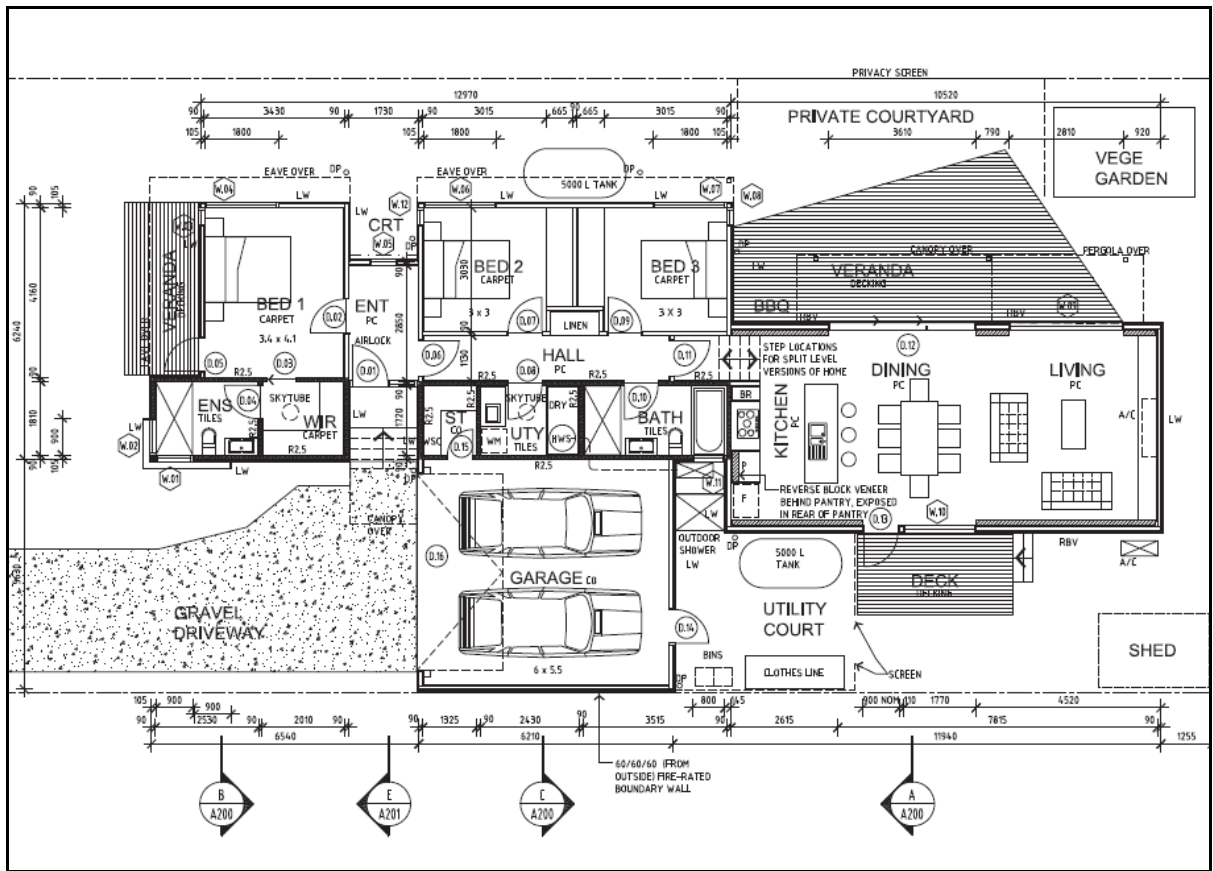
Proposed floor plan (Adam Dettrick Architect, 2012).
